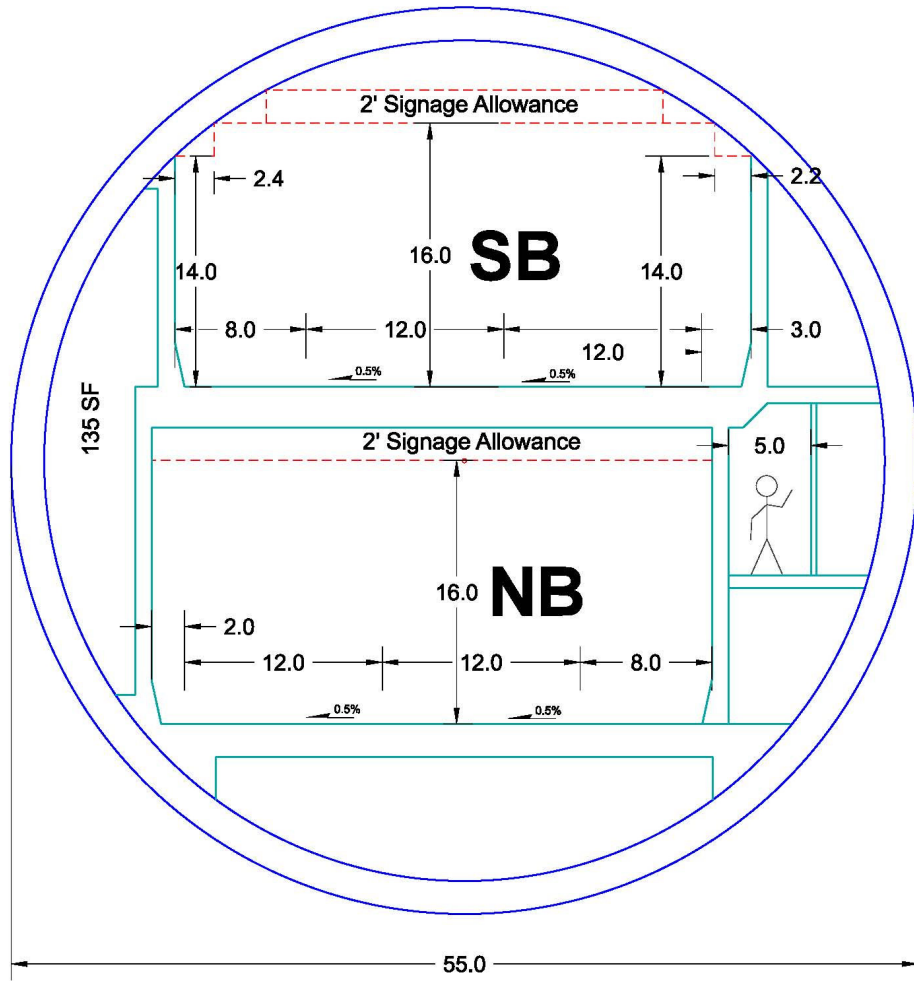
Proposed Tunnel Typical Cross-Section (wall-to-wall dimensions)
